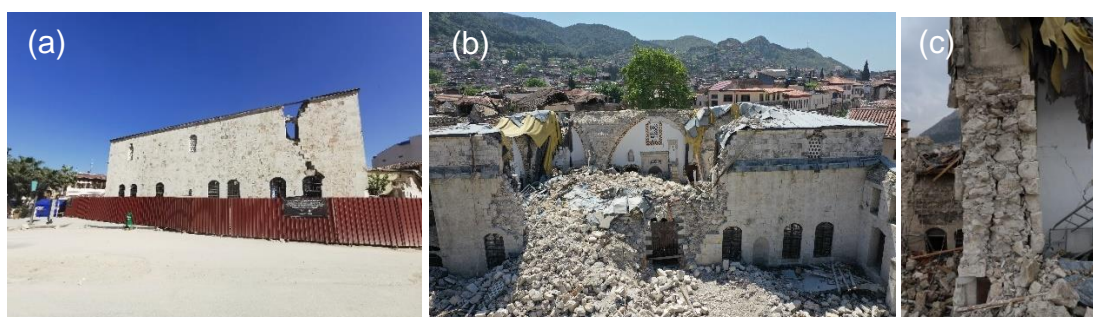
Habibi Neccar Mosque, photographs of (a) the south façade, (b) the collapsed north façade, (c) a multi-leaf wall cross-section from the collapsed north wall of the building.
